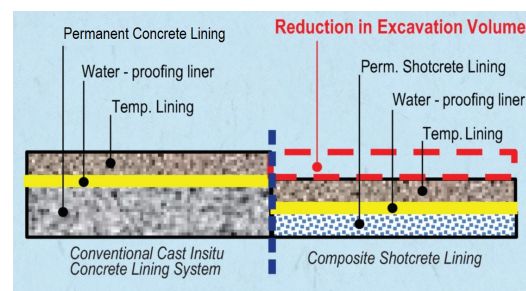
Illustration of cost saving and less excavation by using shotcrete rock reinforcement.
